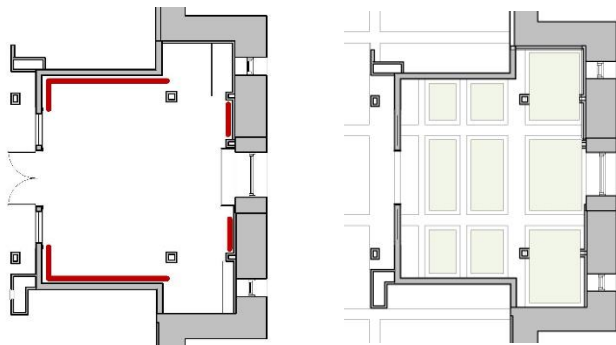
Policy Conference Room Floor Plan and Reflected Ceiling Plan
